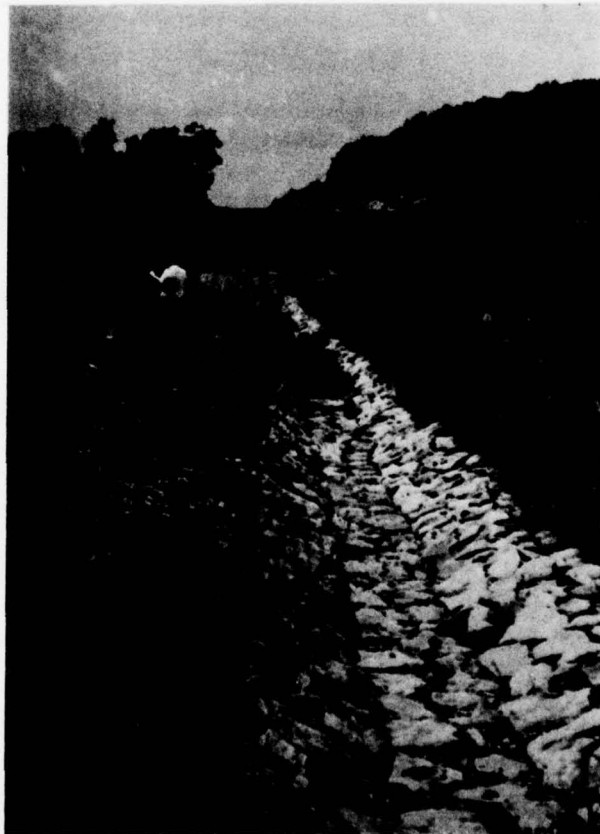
View of stone paved drainage ditch on north side of wall (Photo taken August 3, 1978).
